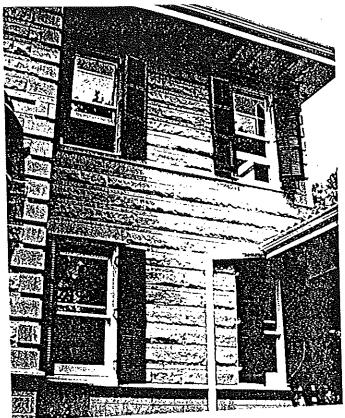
Typical Window Protection of Urban Construction in Garden District
